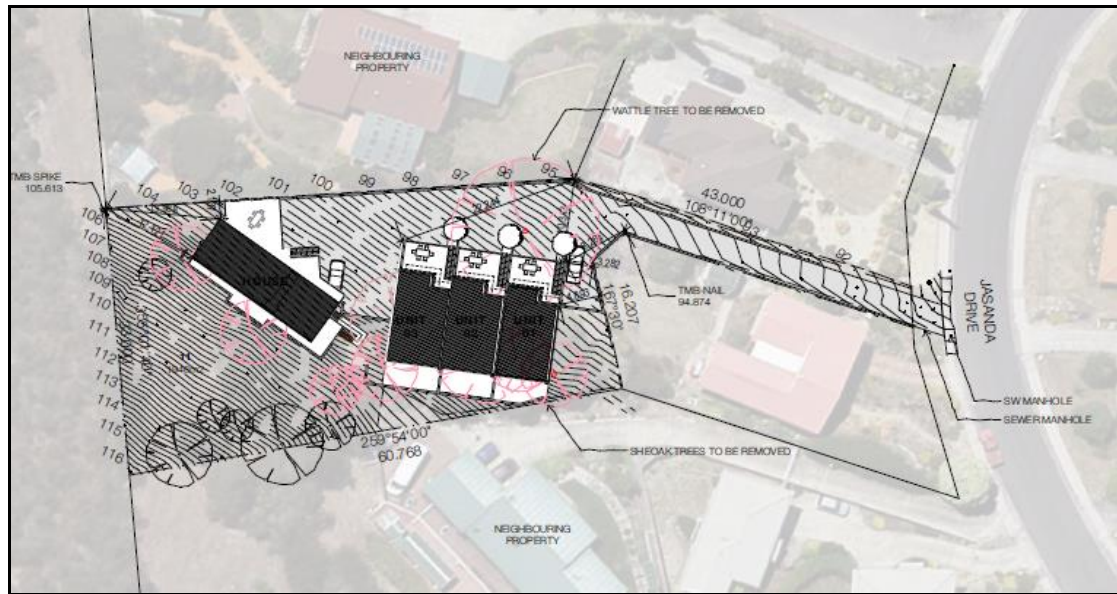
Site Plan of the Proposal - Morrison & Breytenbach Architects
